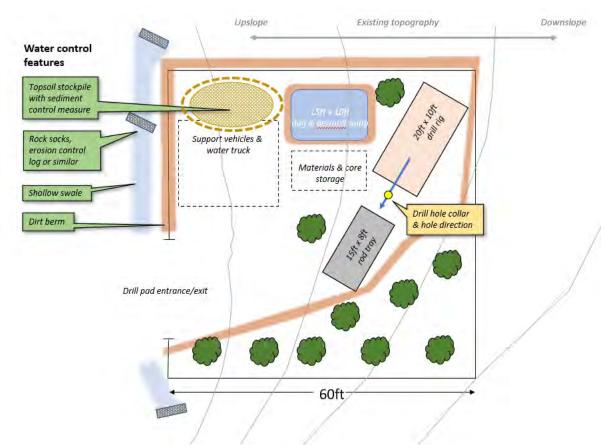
Example water control feature/grading installations for a conceptual drill pad layout on a shallow slope (with minimal leveling required).
